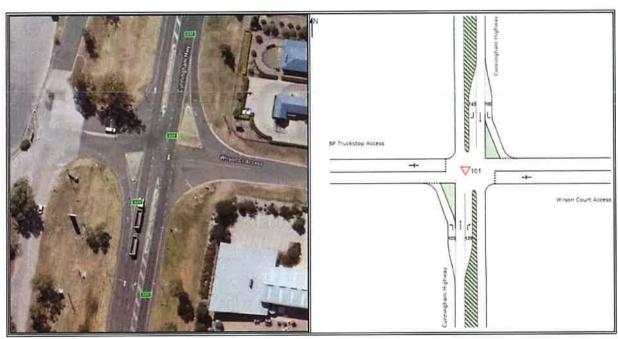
Aerial and SIDRA Layout - Intersection - Cunningham Highway and Wilson Court Access
